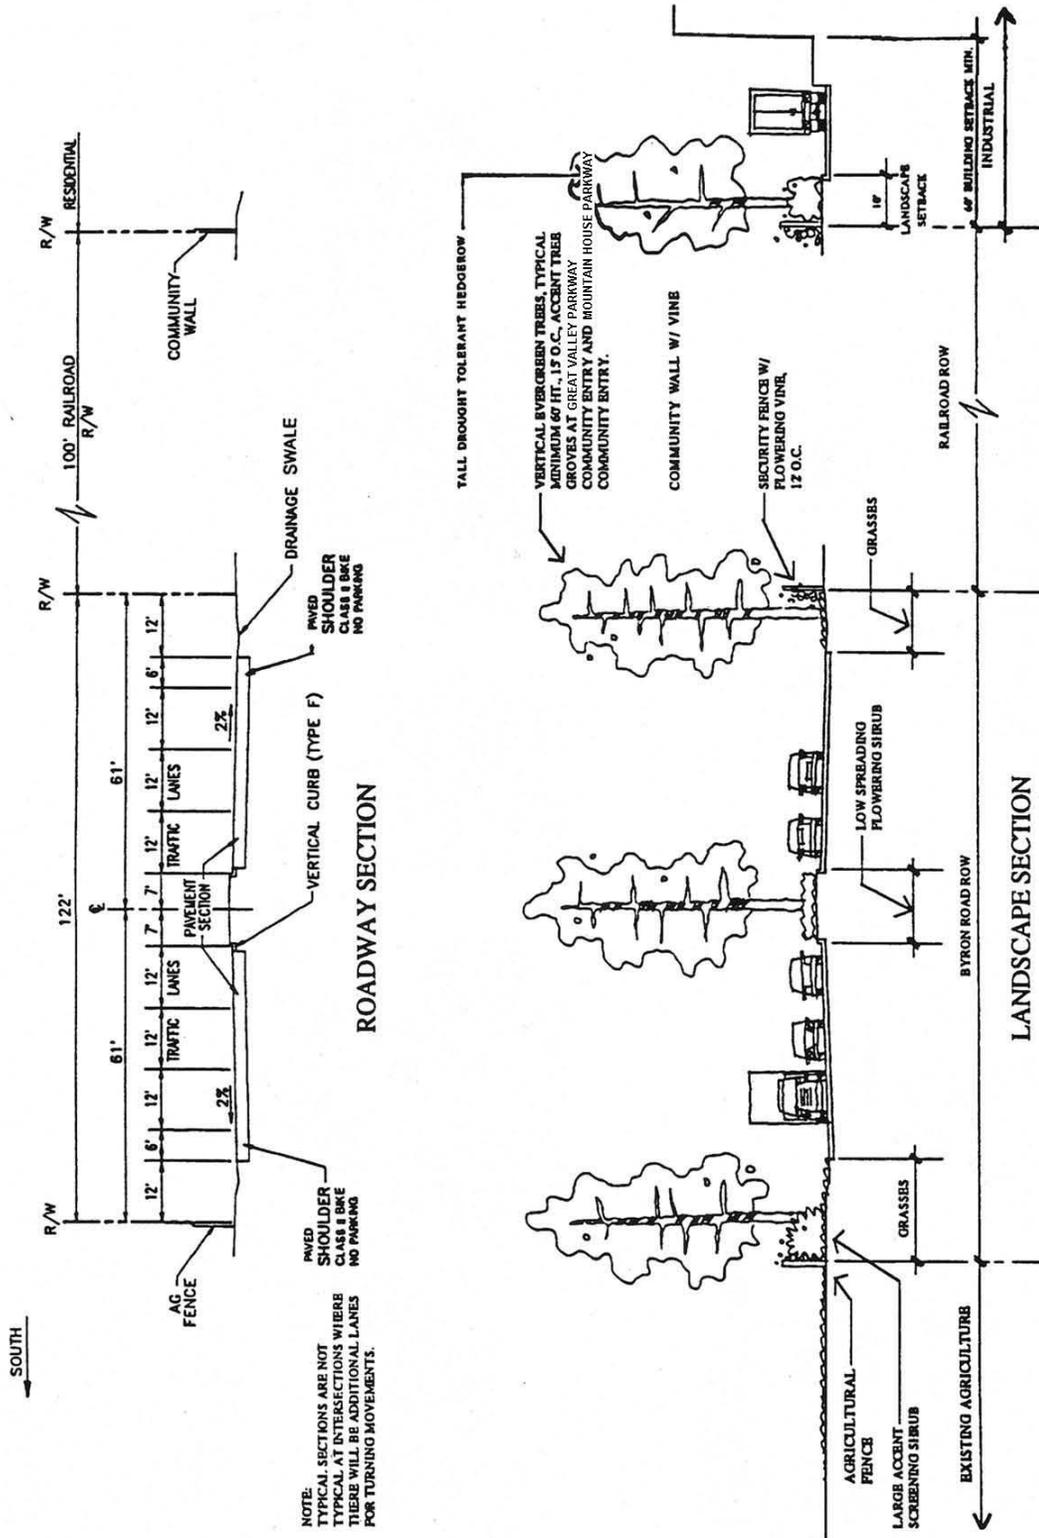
BYRON ROAD (WICKLUND ROAD TO MOUNTAIN HOUSE PARKWAY) - MAJOR ARTERIAL
